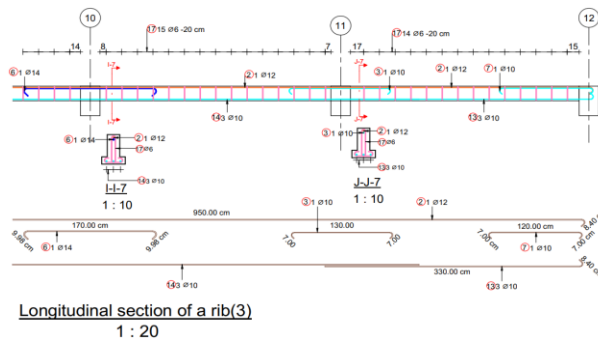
Longitudinal cross-section of the rib (part 3)
